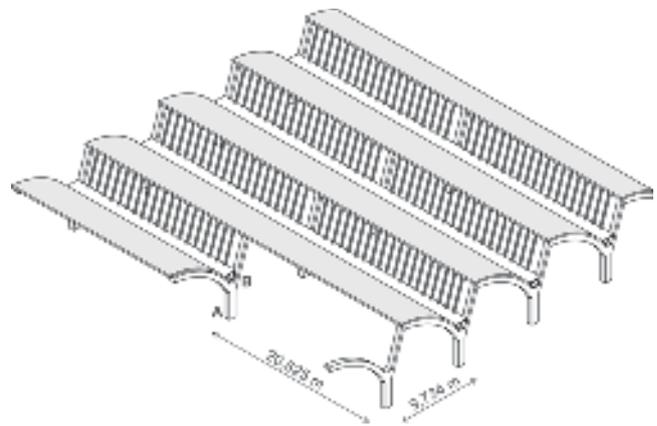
Siemens complex in via Monte Rosa in Milan, structure of the workshop building (drawing by the authors): thin vaults are supported by parabolic beams on the pillars (A) and connected by prefabricated window shed struts (B).
